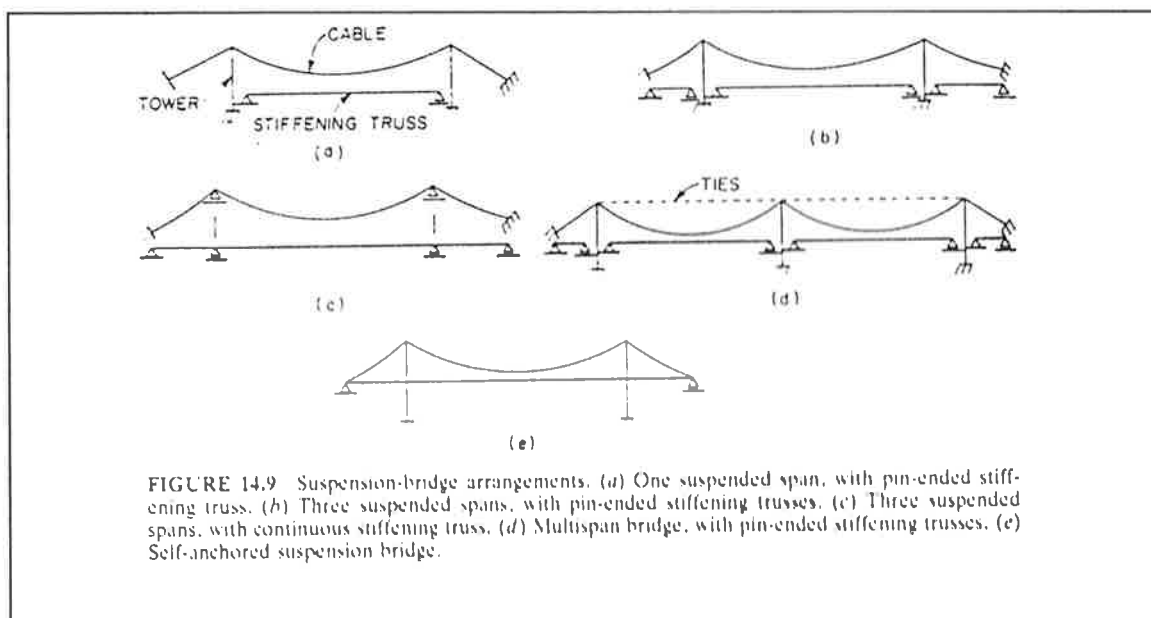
Suspension-bridge arrangements. (a) One suspended span, with pin-ended stiffening truss. (b) Three suspended spans, with pin-ended stiffening trusses. (c) Three suspended spans, with continuous stiffening truss. (d) Multispan bridge, with pin-ended stiffening trusses. (e) Self-anchored suspension bridge.
